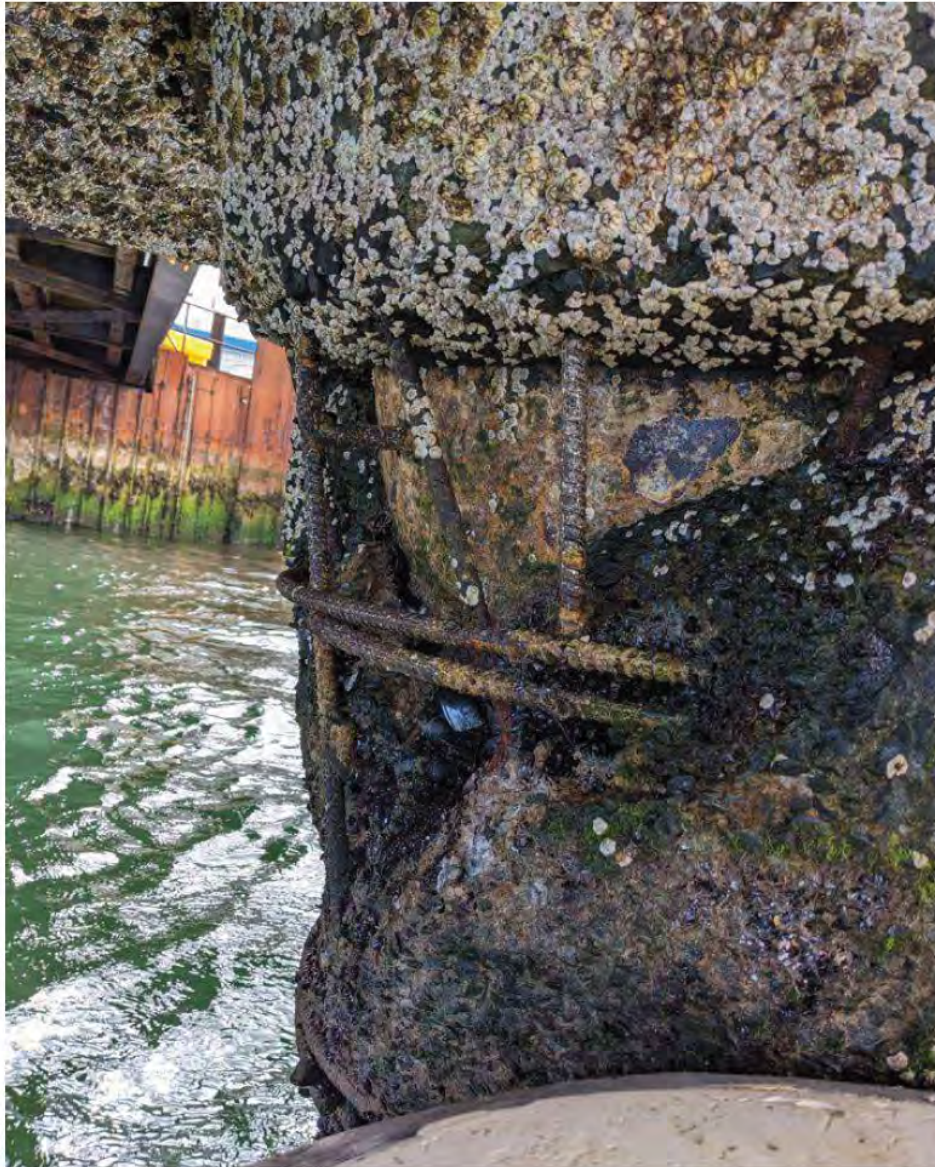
Photo showing the one of the piles at Pier 1. The concrete cover for the steel pile has spalled off locally and the rebar is exposed and has started to corrode.
